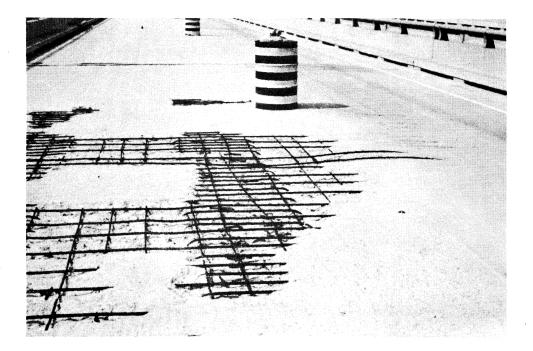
View of repaired areas in span 10 of NBL adjacent to the study span of bridge #9.
